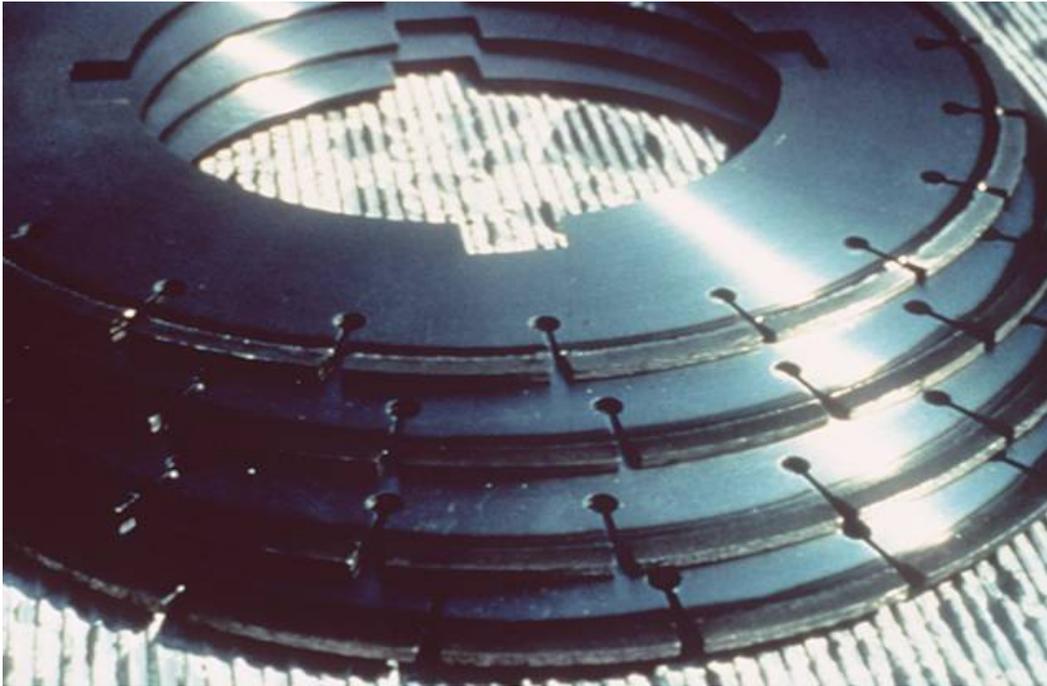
Diamond blades (Courtesy of Caltrans)
